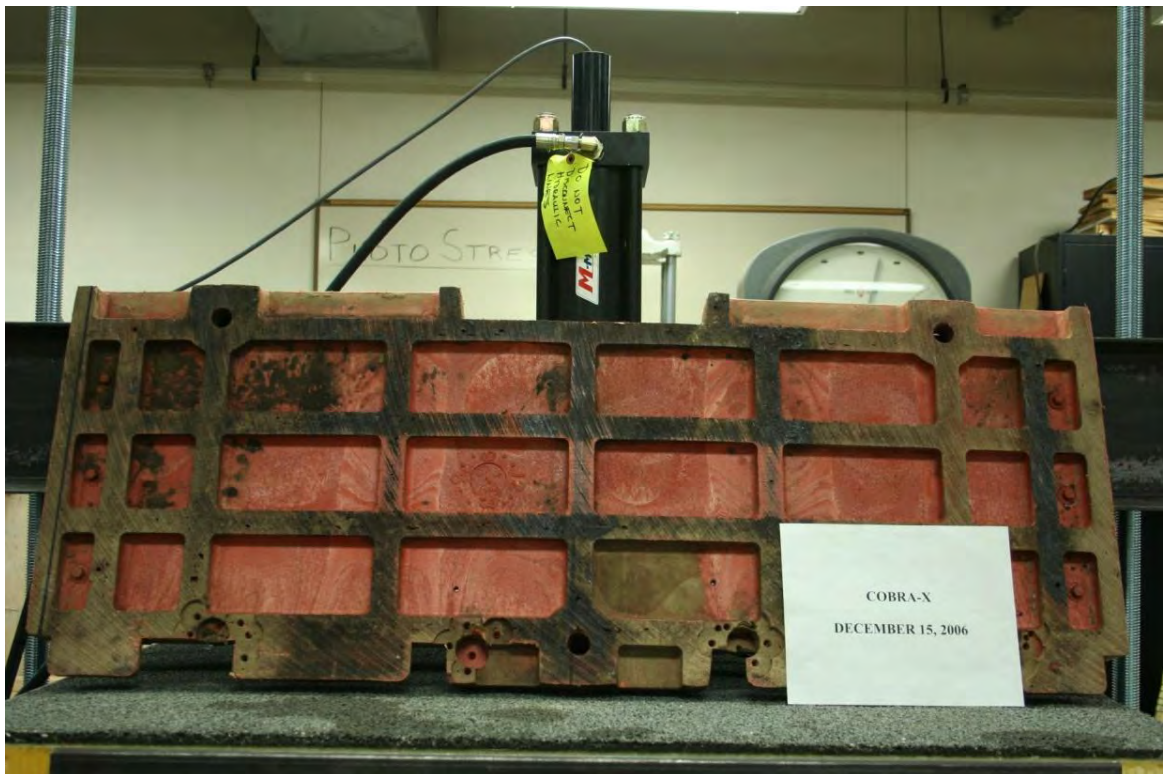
Cobra X bottom side, typical bridge-deck panel.
